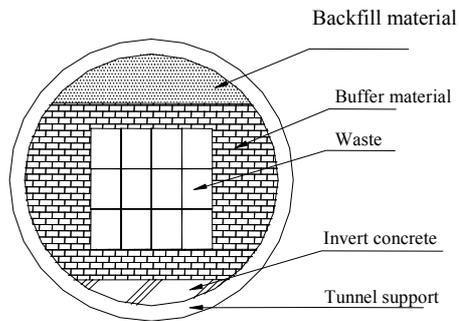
Example of construction of backfill in the upper part of a disposal tunnel (circular disposal tunnel)
